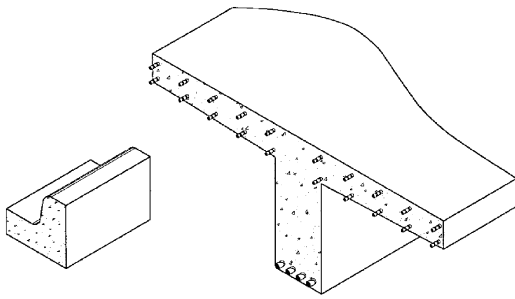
Examples of plain and reinforced concrete: plain curb and gutter (left) and reinforced concrete T-beam (right).
